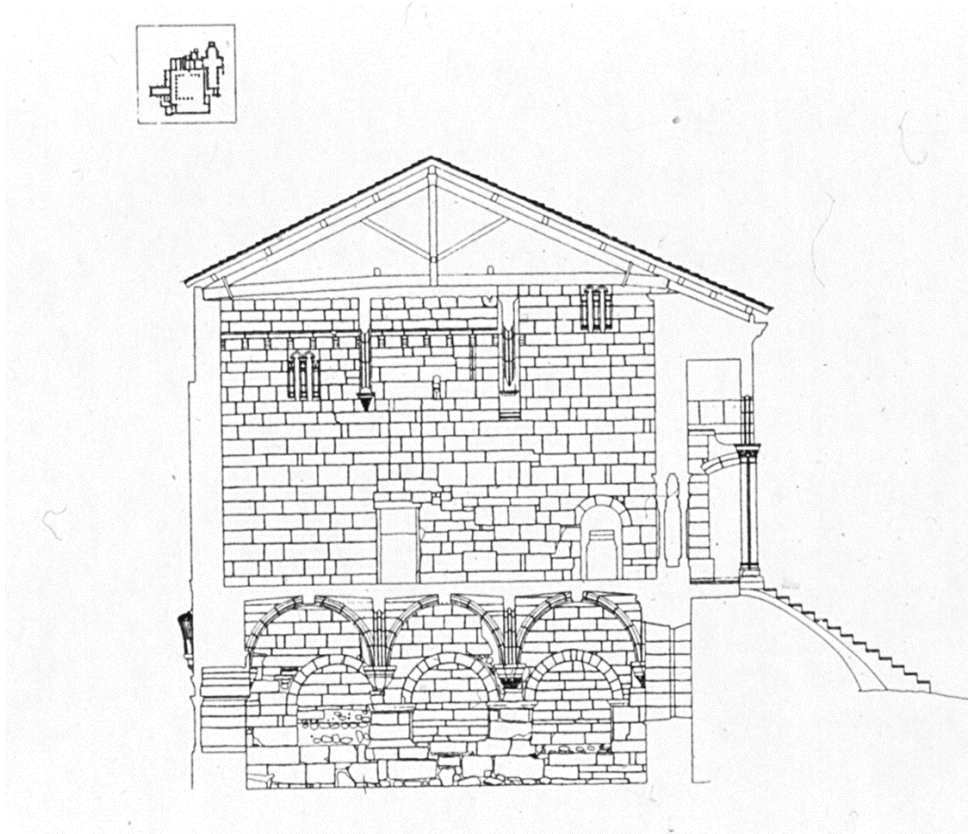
Transversal section across “Capitulo” and “Cocina de la Reina” of Santa María de Carracedo Monastery in Carracedo, León (Spain). Section by Salvador P. Arroyo and Susana Mora.
